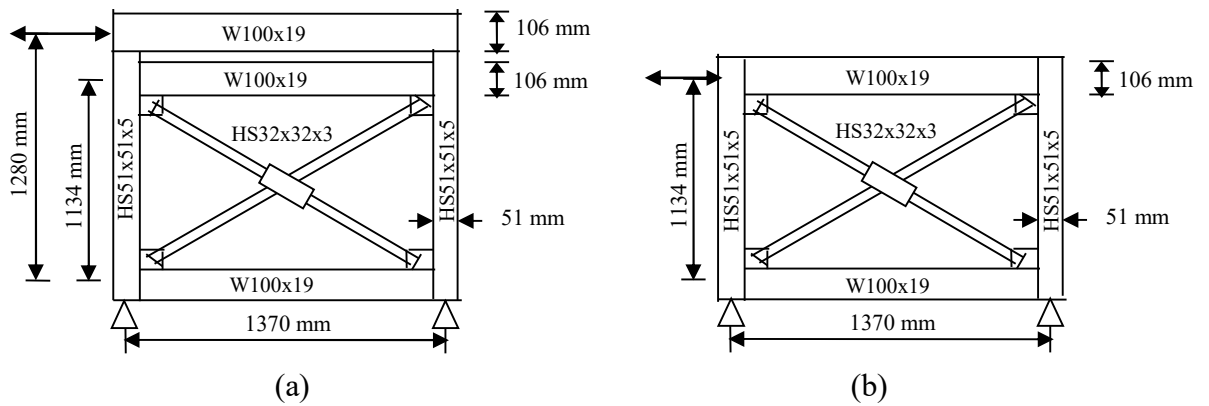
Dimensions of test specimens (a) MSB braced frame (b) Regular braced frame
